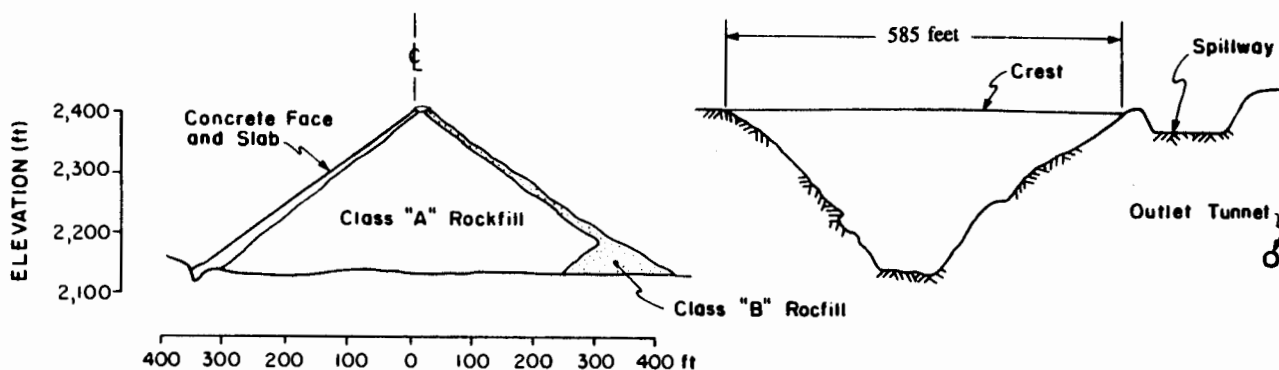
Transverse and longitudinal cross-sections of Cogswell Dam
